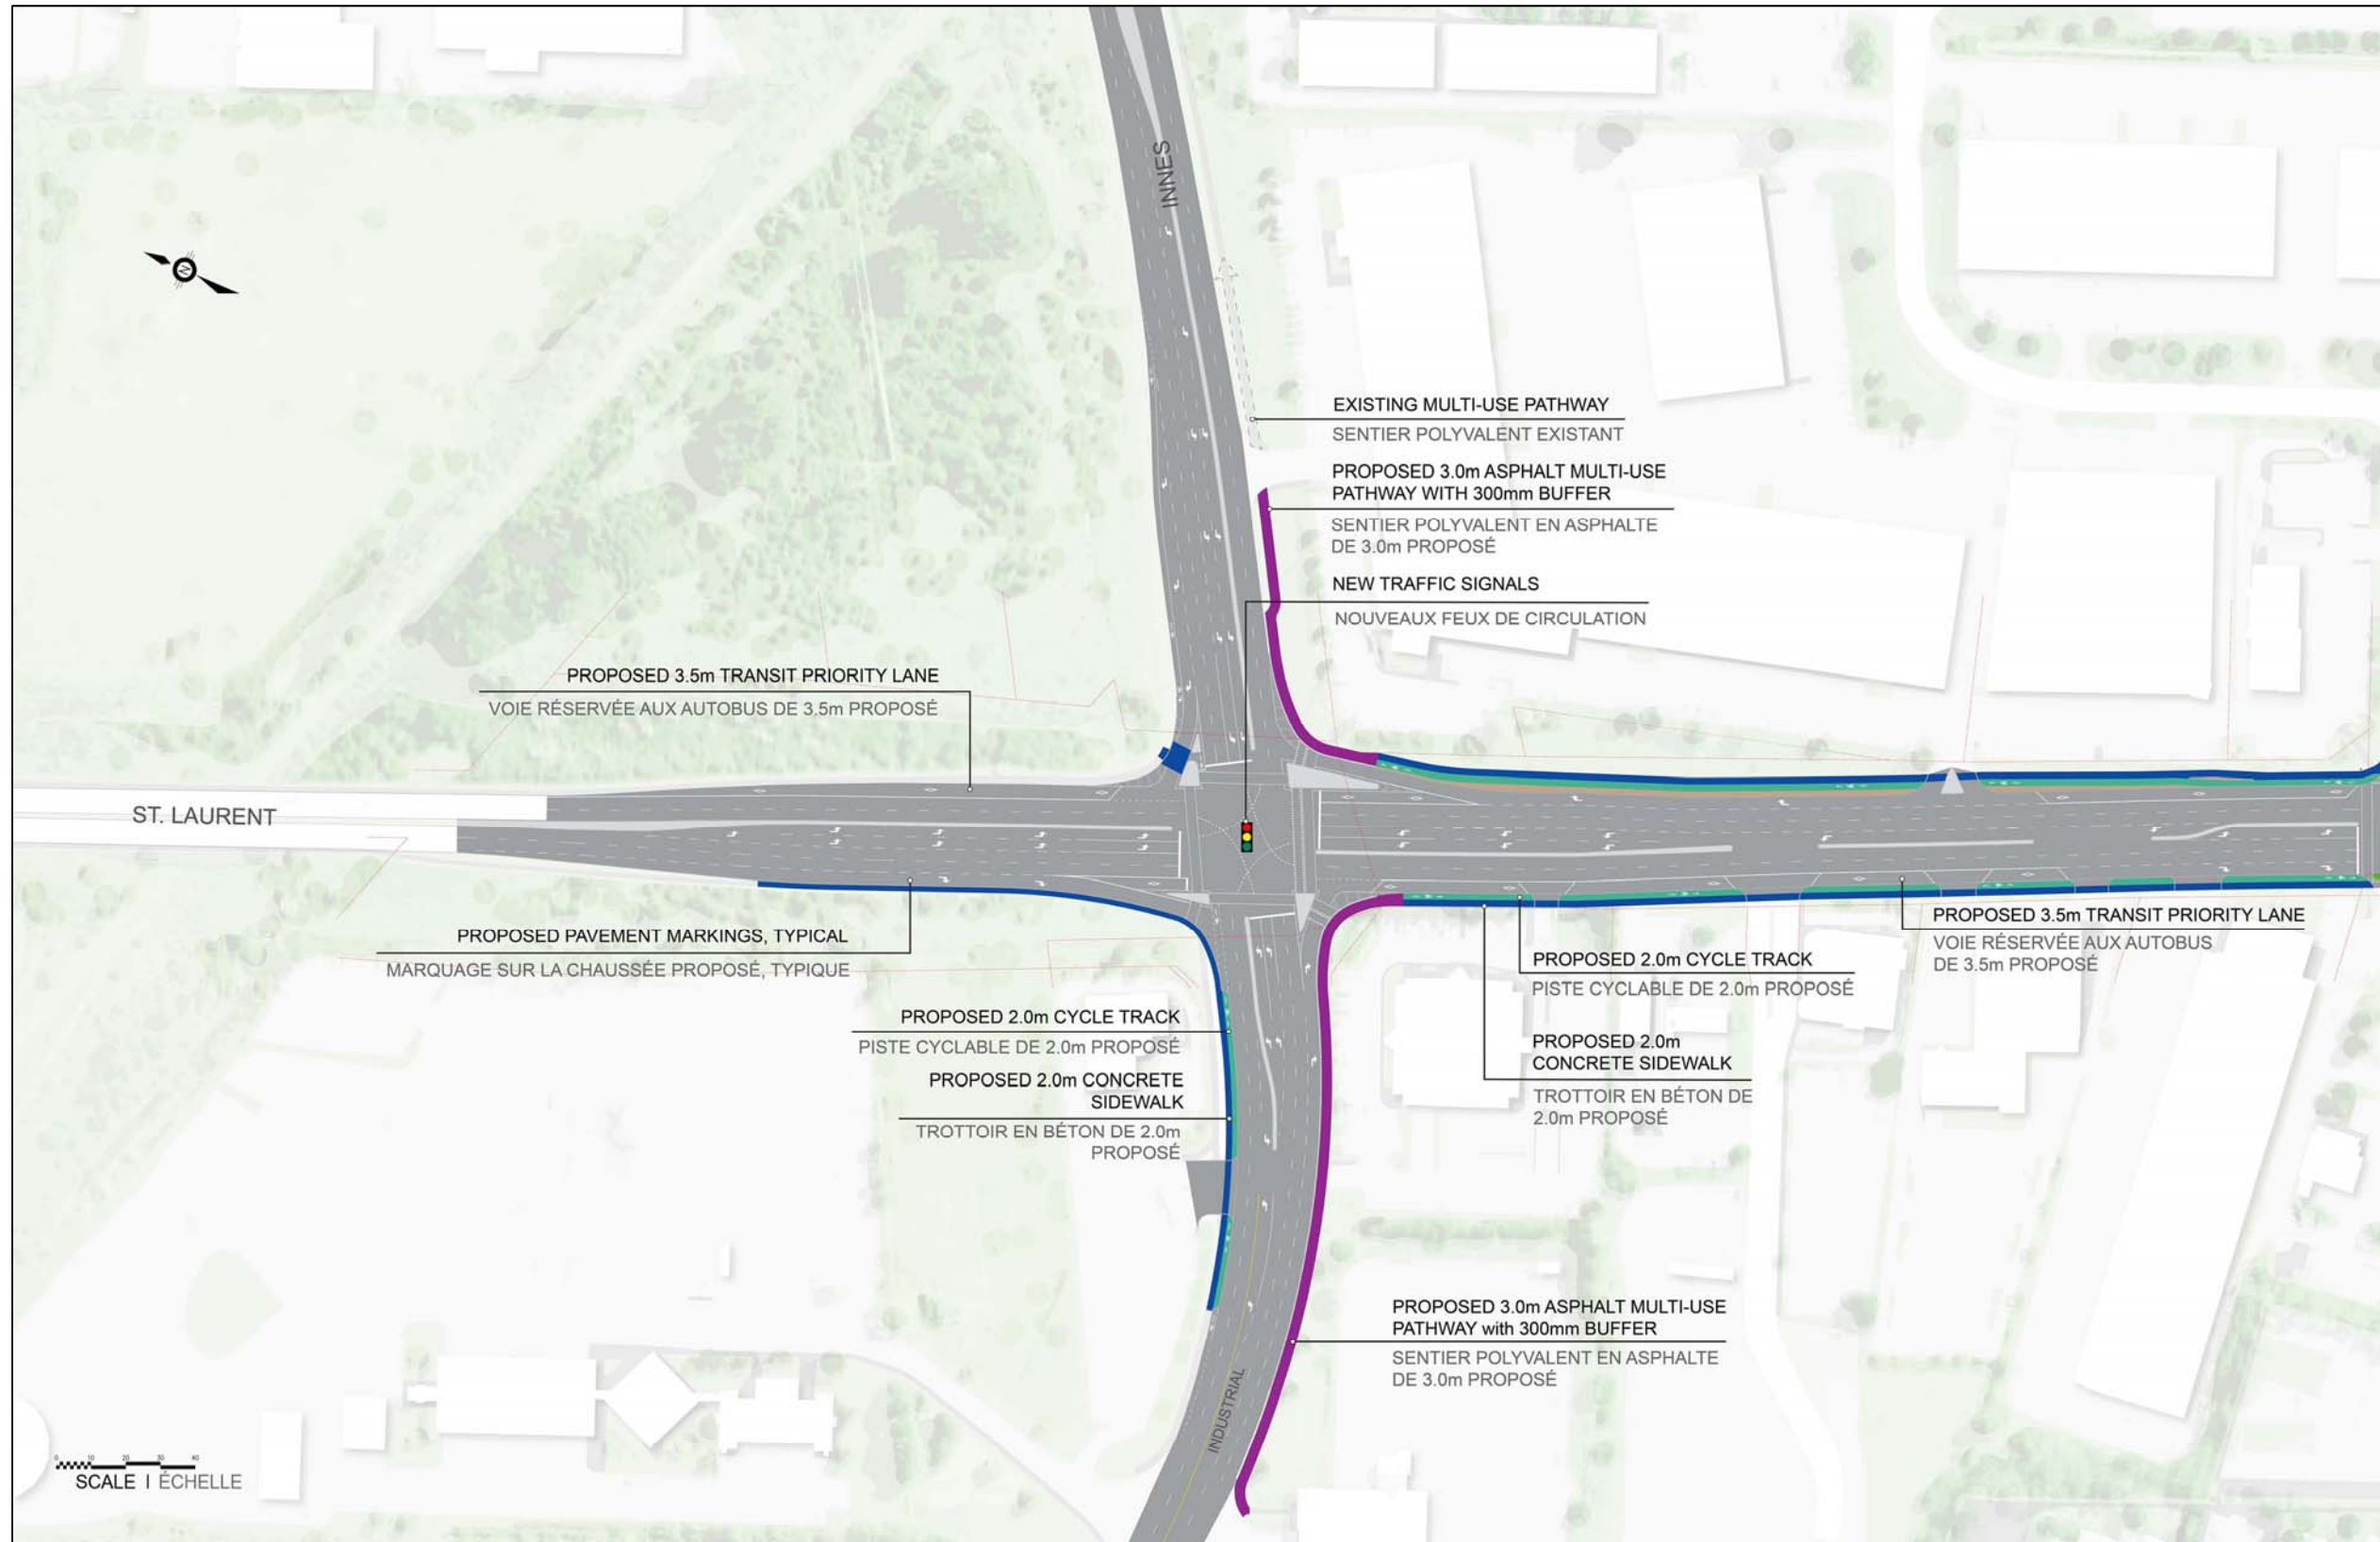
Overview of Recommended Plan, North of Innes Road / Industrial Avenue to Bourassa Street
